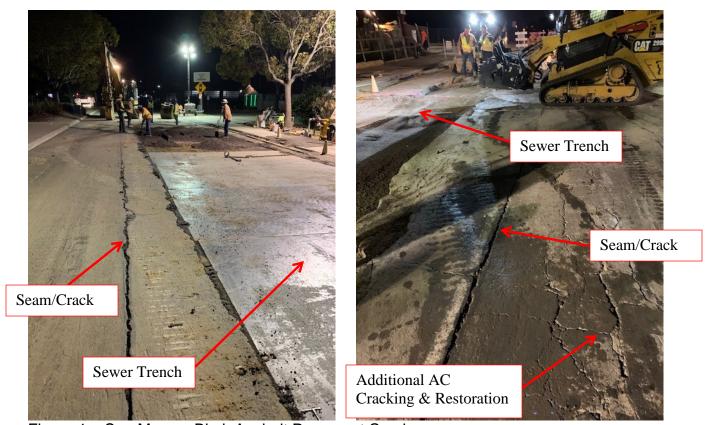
San Marcos Blvd. Asphalt Pavement Crack
